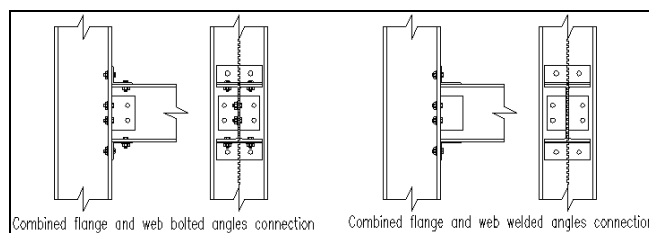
Consolidated rib and web bolted and welded edge connections (Balc, 2012)
